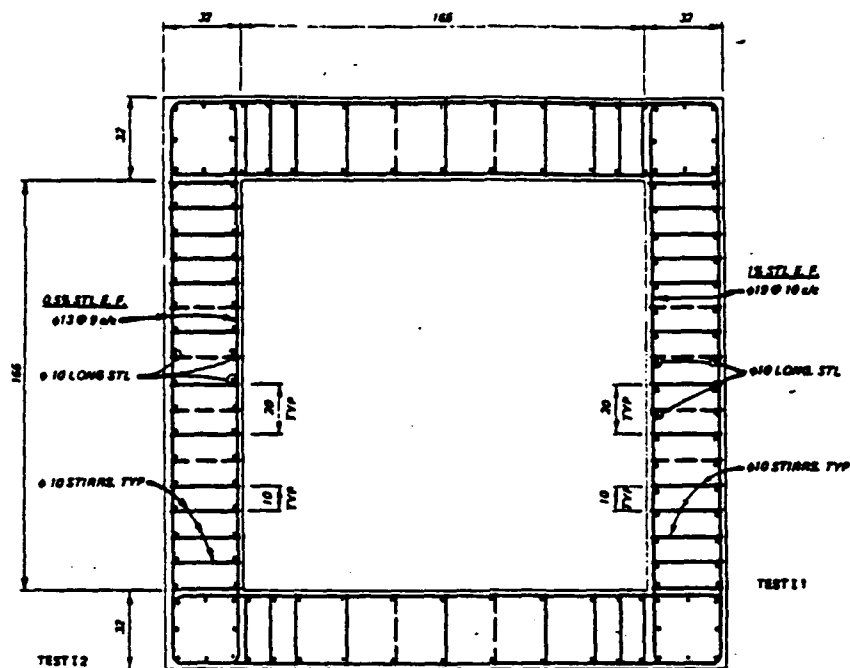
Reinforcement Details for Walls I-1 and I-2.
